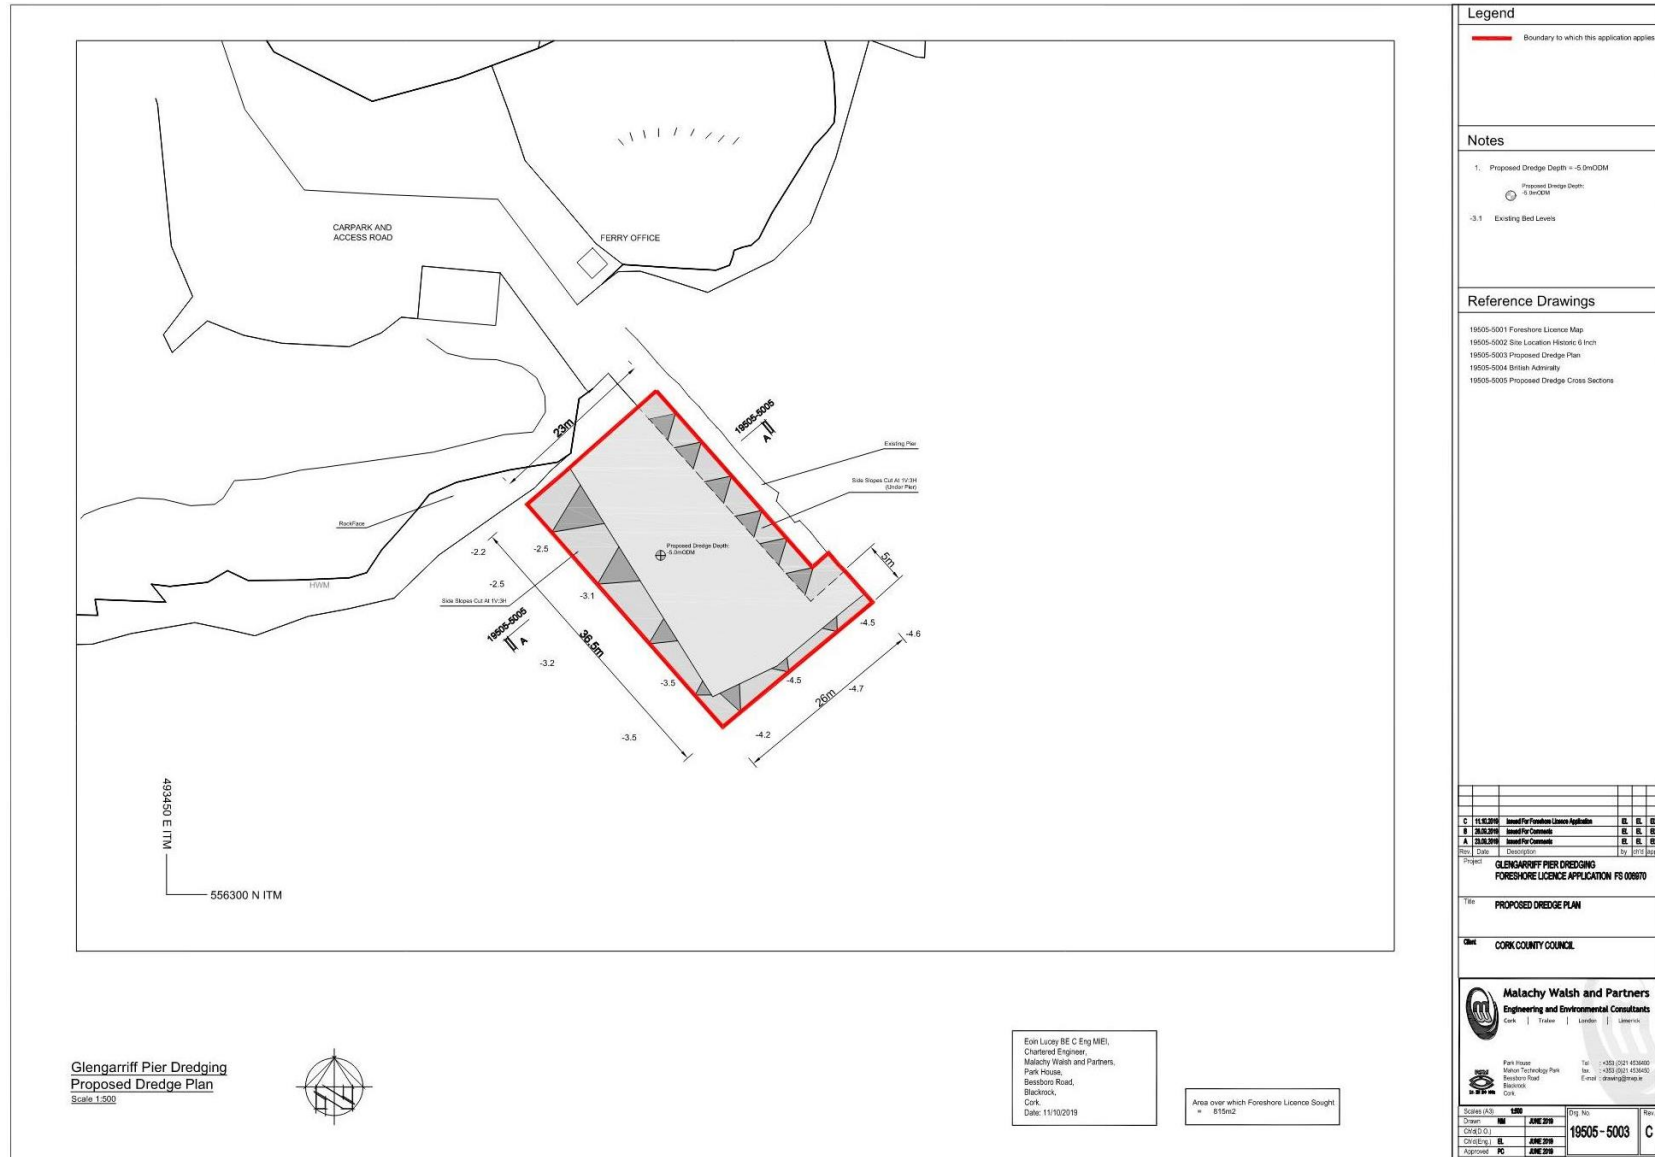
Glengarriff Pier Dredging Project Site Boundary
